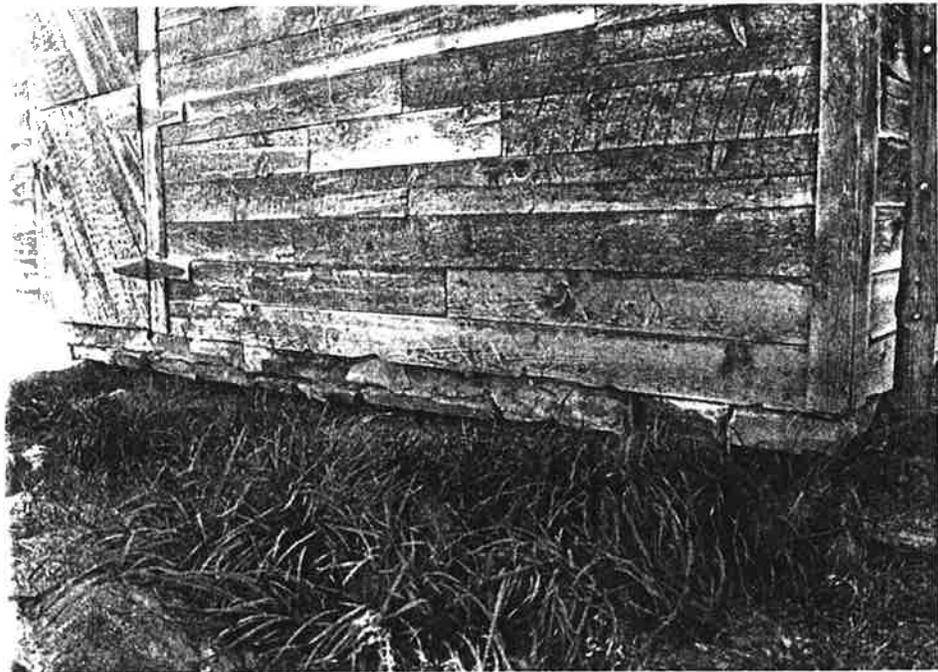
Birch Creek barn, north side, depicting undercutting below foundation caused by the March 1993 flood. (Neg. R2-27)
